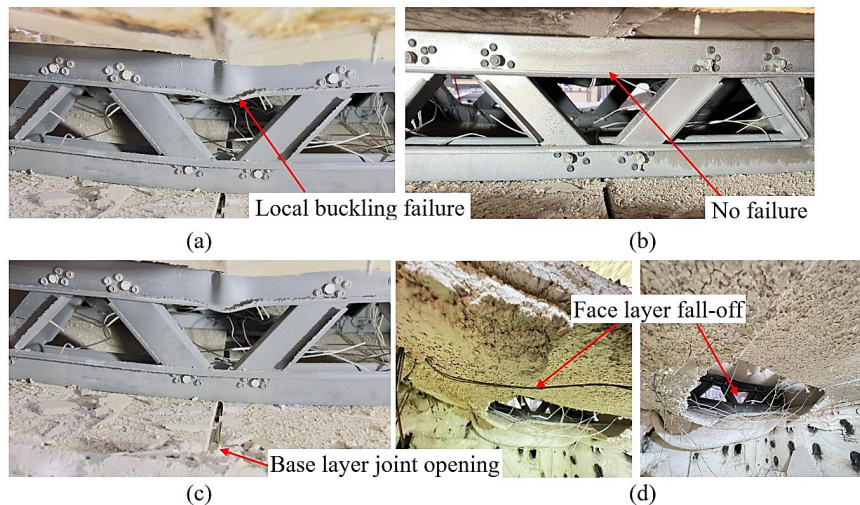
Post-failure observations of Specimen F1 (a) locally buckled left truss (b) no failure of right truss (c) base layer joint opening (d) face layer plasterboard fall-off
